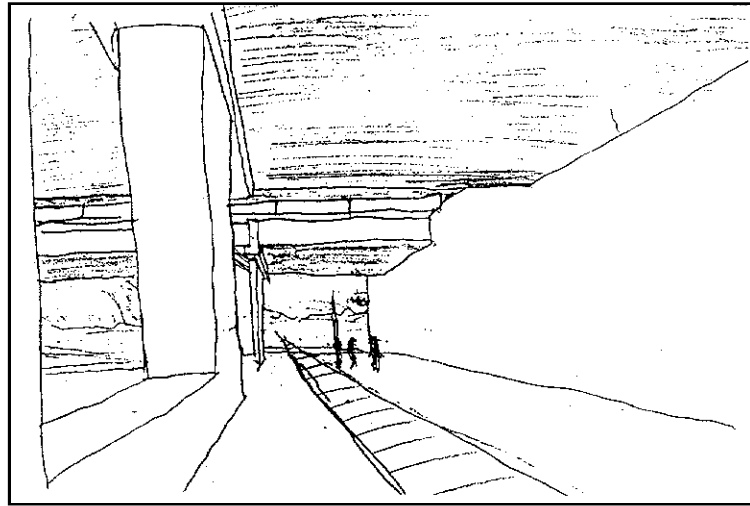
Artist's rendering of the tunnel-like space created by skewed bents (left) next to a large skewed abutment wall (right).
